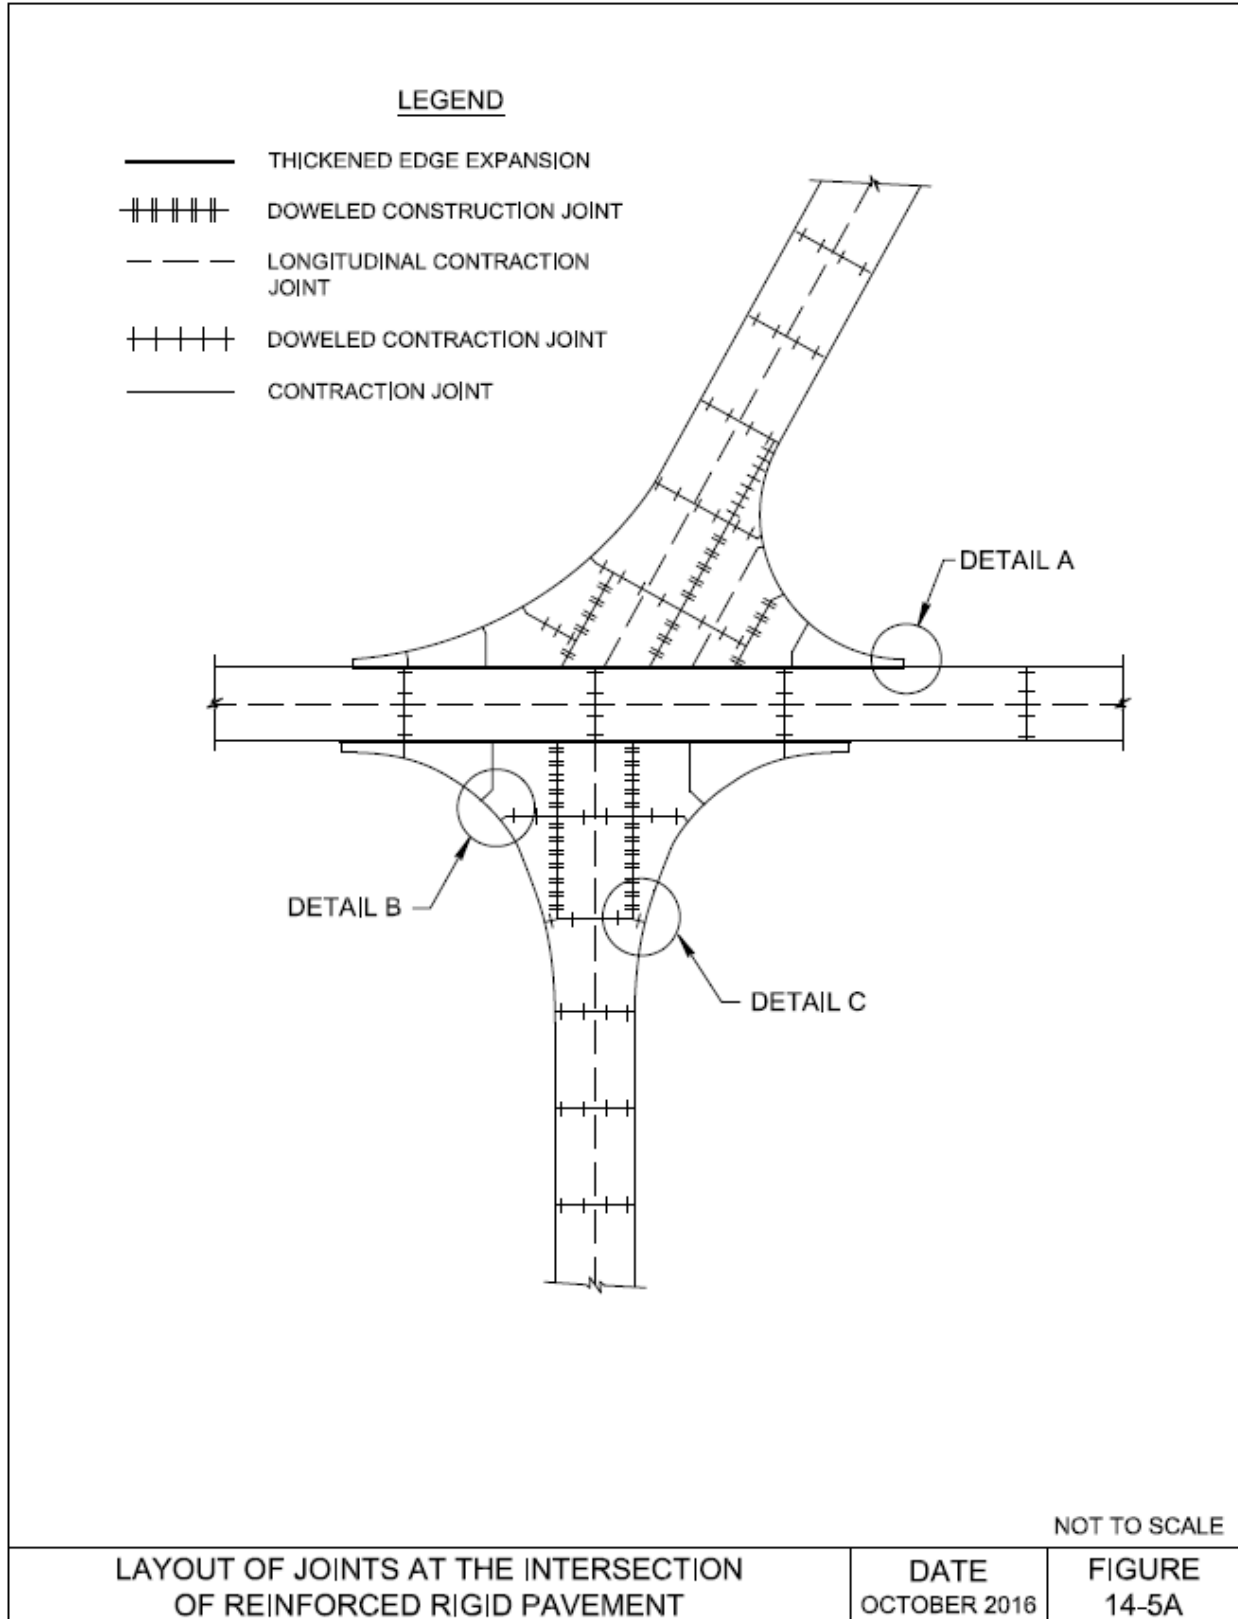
B Layout of Joints at the Intersection of Reinforced Rigid Pavement
